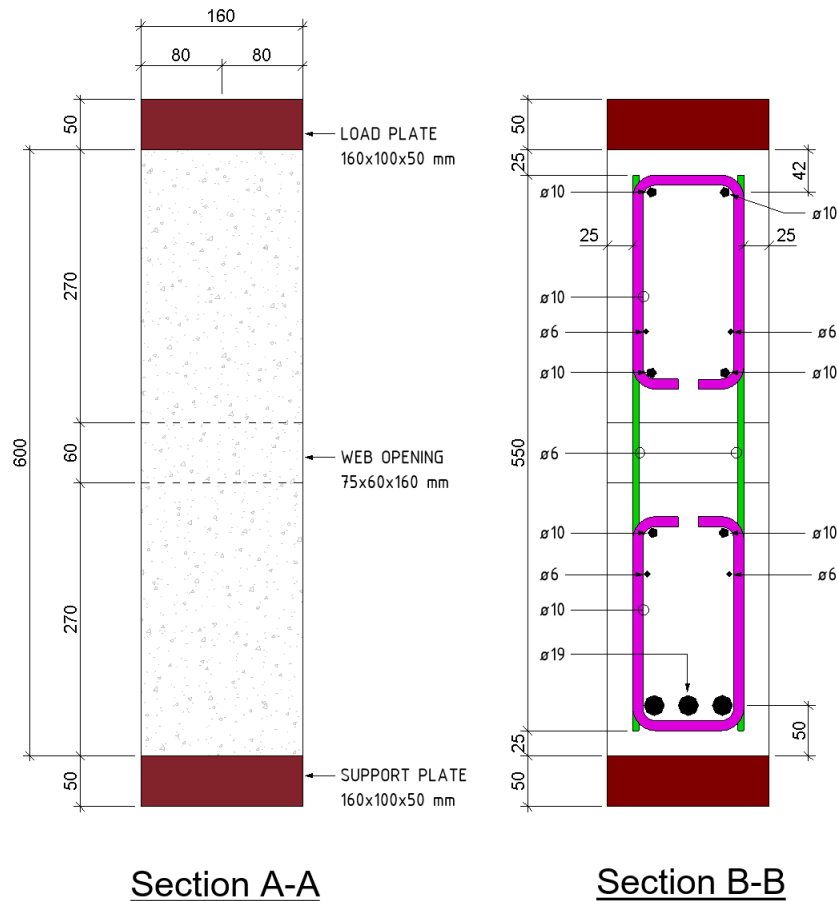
T1-0. Rebar- and concrete cross section. Dimensions in mm. Modelling tool [Autodesk Inc., 2018].
